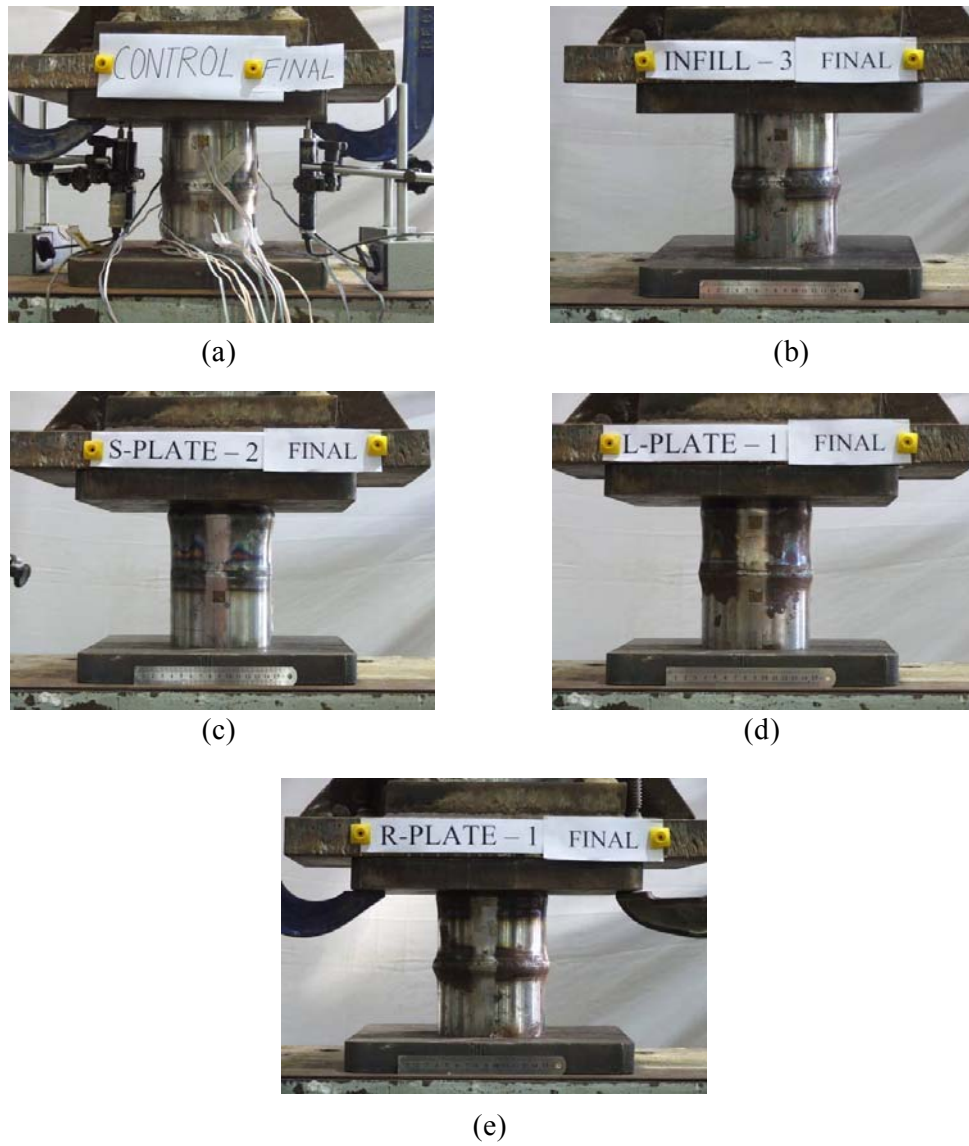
Failure modes of column stubs: (a) Control specimen; (b) Infilled; (c) S-plate; (d) L-plate; (e) R-plate
